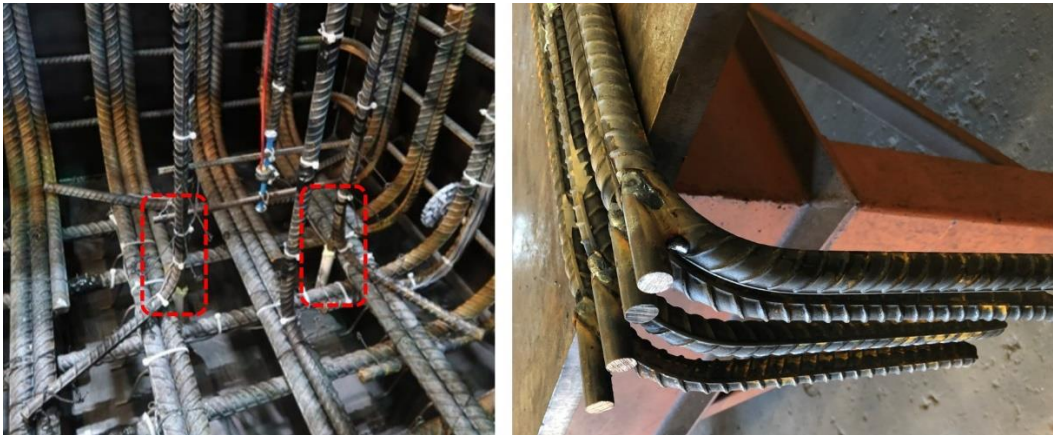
Welded hooked reinforcement to measure drilled shaft reinforcement slip
